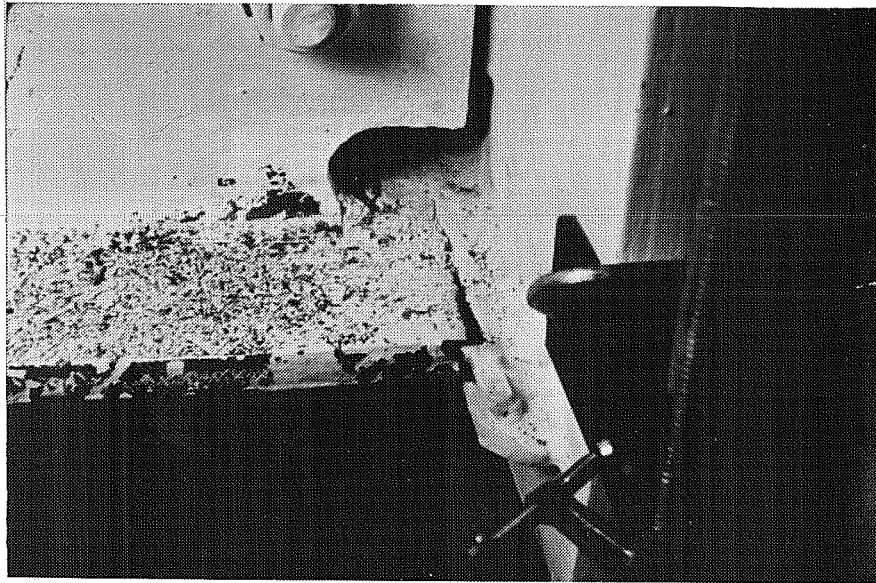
Bottom Flange Crack Initiation in Specimen 5
